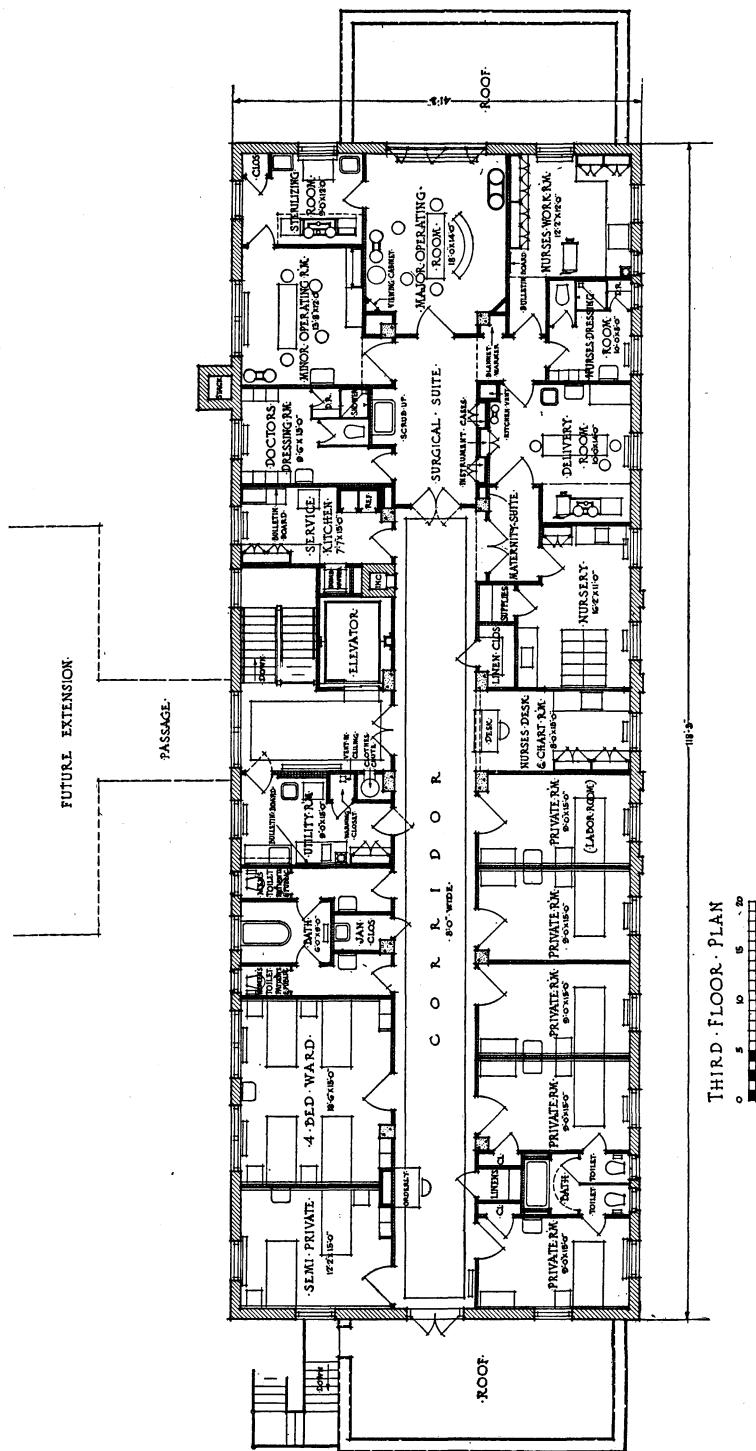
The third floor would be used in each of the three hospitals—the 25-, the 35-, or the 46-bed—as it has the operating rooms, the maternity suite, and other facilities.
